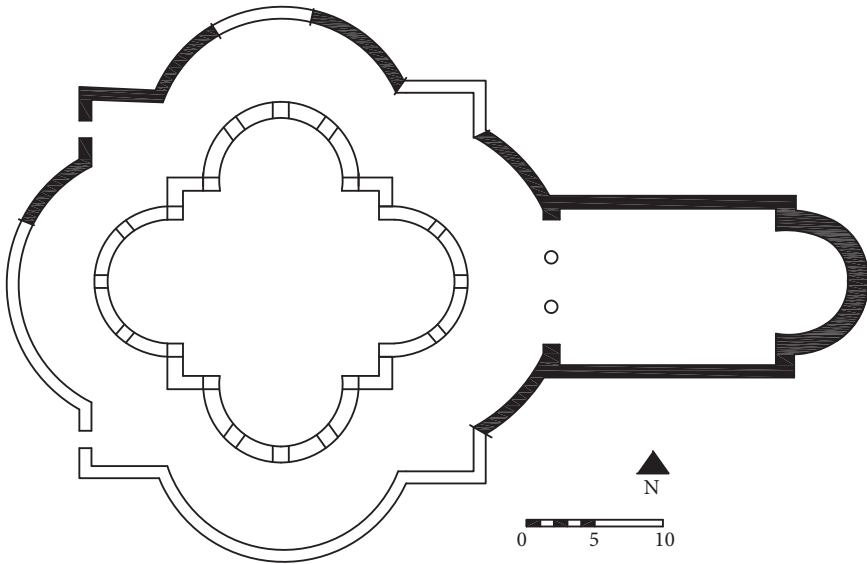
Reconstructed plan of the Church of Yoldath Aloho
